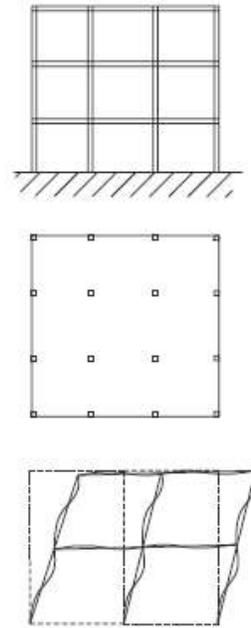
Elevation, plan and deformed shape of moment resisting frame (Szakats 2006)
